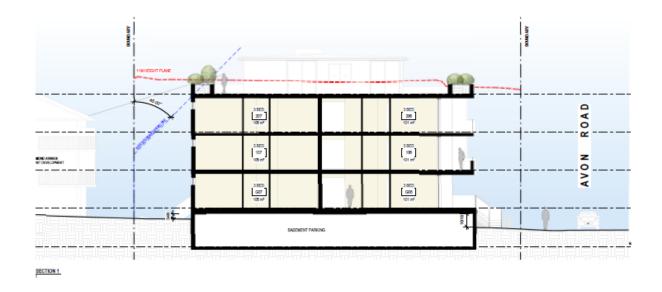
cross sections of the proposed building and the extent to which they relate to the 11m height plane
